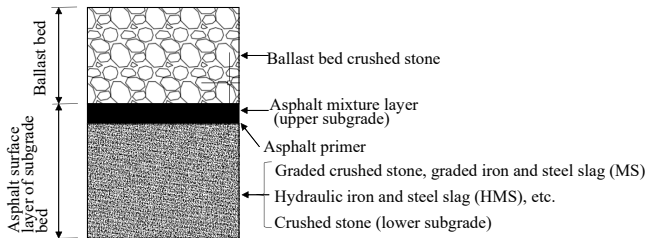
Schematic cross section of asphalt surface layer of subgrade bed for ballasted tracks in Japan
